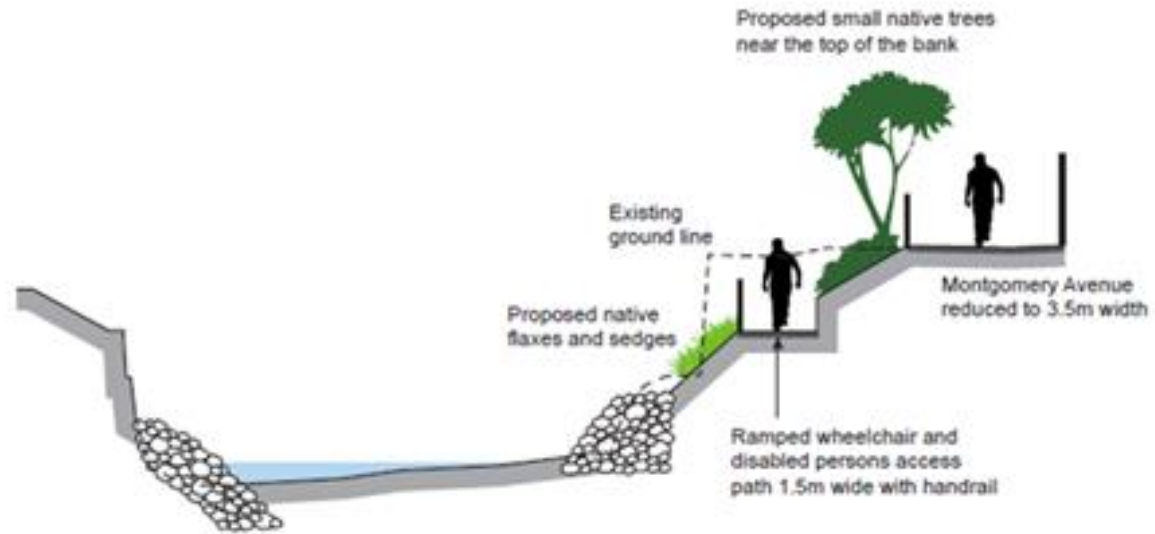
Cross-section A – A, upstream of St David Street Bridge (looking downstream)
